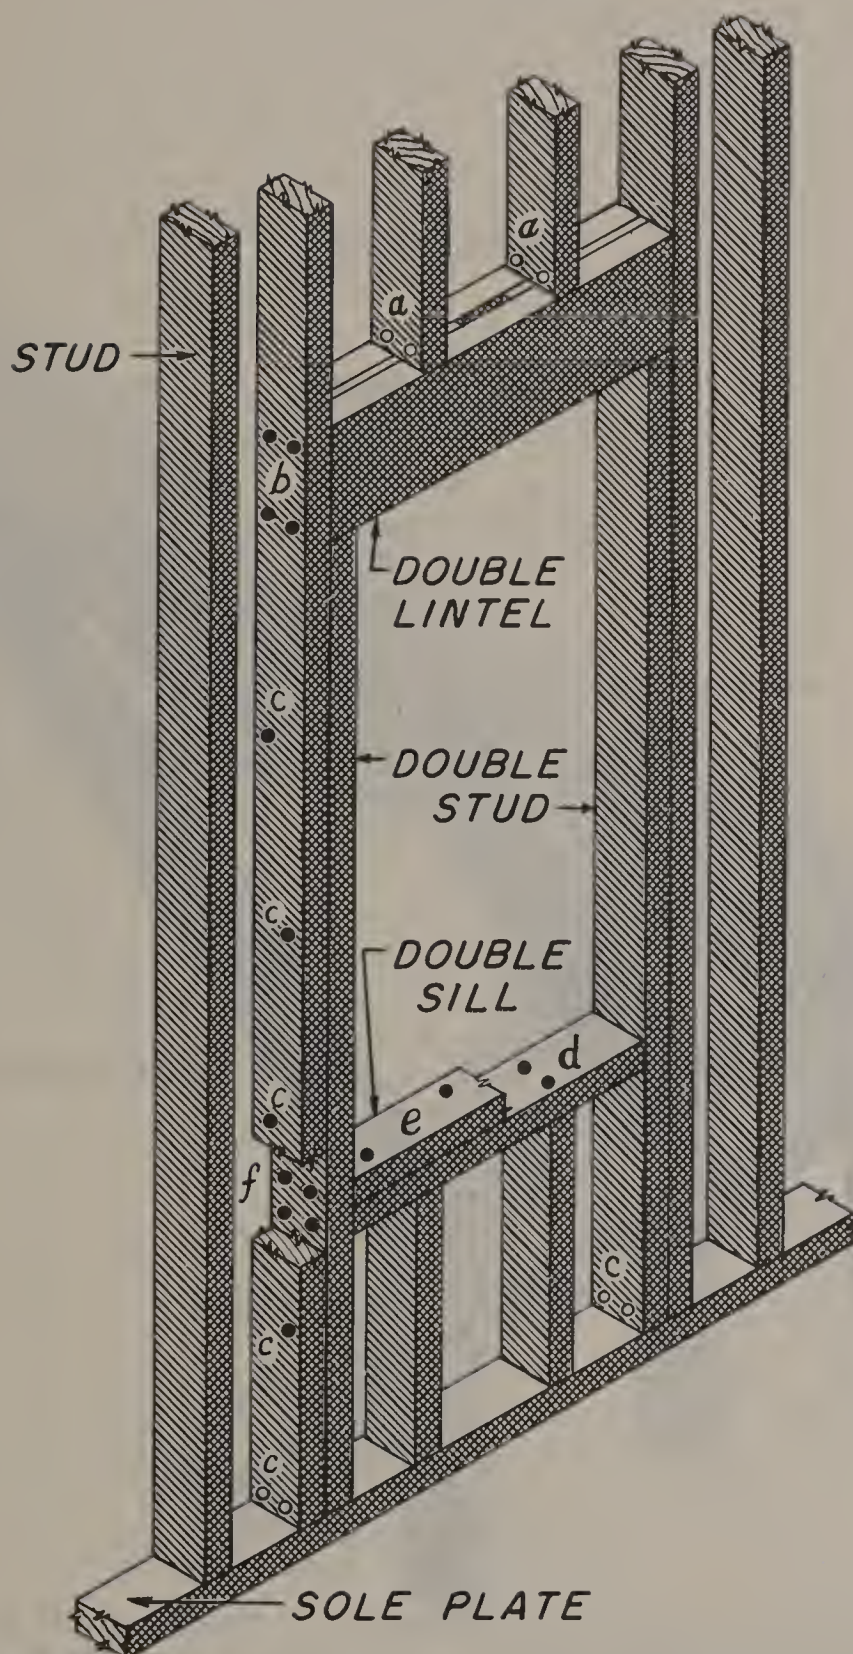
Window opening. *a*. Studs above opening toenailed to each part of lintel with one tenpenny nail. *b*. Long studs nailed to ends of each part of lintel with two tenpenny nails. *c*. Double studs nailed together with tenpenny nails spaced 16 inches and staggered as shown, and toenailed to sole plate with four tenpenny nails, two from each side. *d*. Lower part of sill member nailed to end of each stud below it with two tenpenny nails. *e*. Upper part of sill member nailed to lower with tenpenny nails spaced 8 inches and staggered as shown. *f*. Studs alongside opening nailed to ends of each part of sill member with two tenpenny nails.
